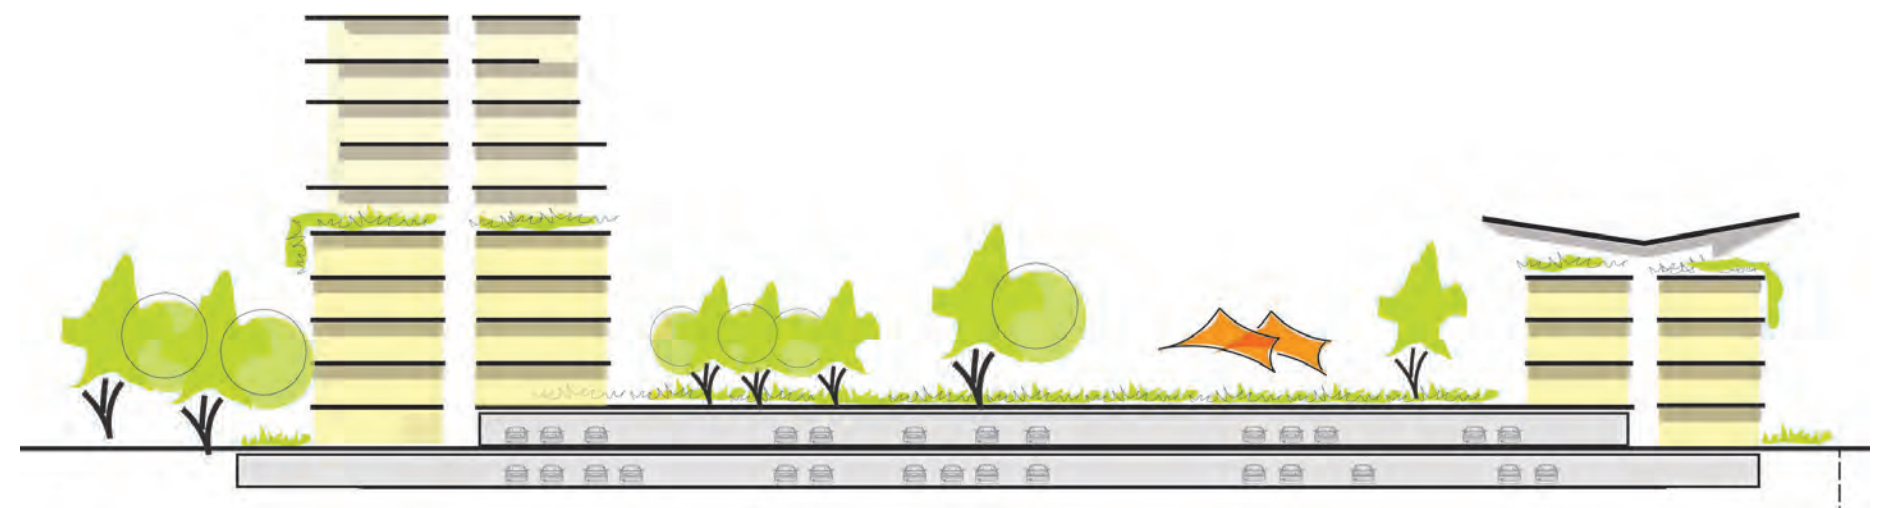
67 Integrated MSP and underground parking strategy section diagram
